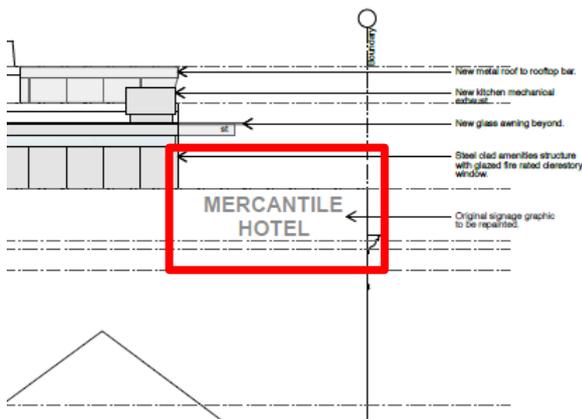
Extract of architectural plan with proposed placement and form of signage
